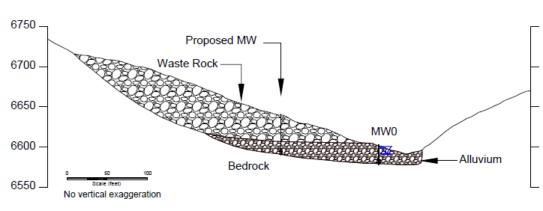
Cross Section of South Waste Rock Pile Showing Proposed Monitoring Well
